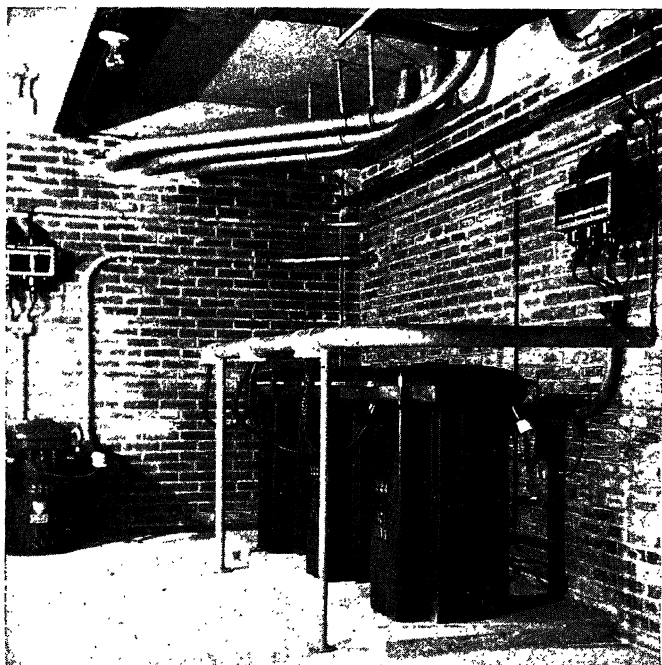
Station power and lighting transformers installed in a separate vault.
